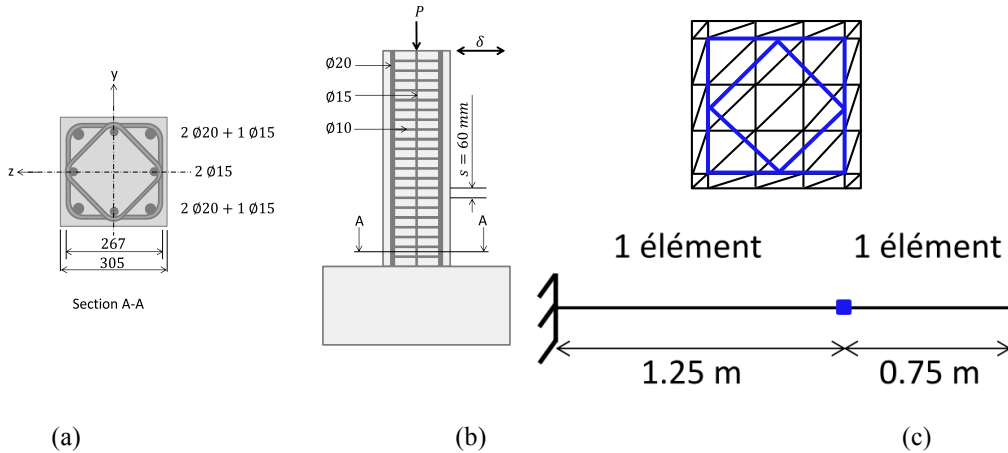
Reinforced concrete cross section confined with stirrups, (b) columns submitted to axial loading and transversal cyclic displacement [15], (c) Transversal and longitudinal numerical discretization of the column
